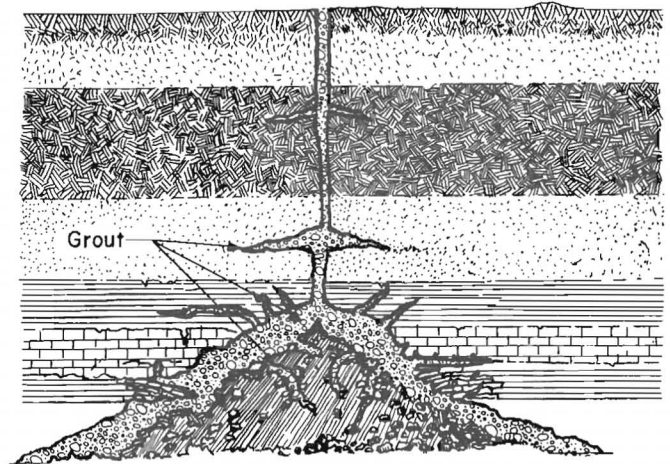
Pressure grouting to stabilize collapsed overburden.
